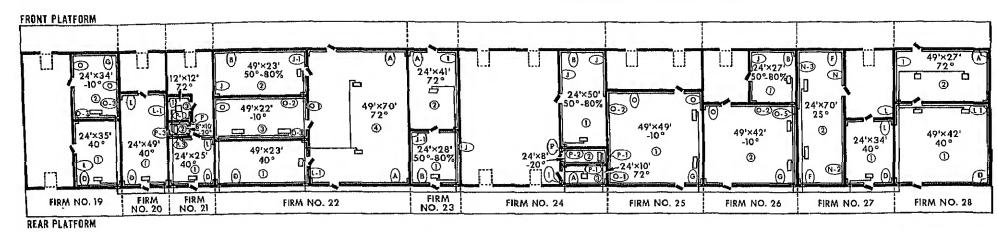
Situation III, Building No. 3 (poultry and eggs), floor plan and air-handling equipment layout,
